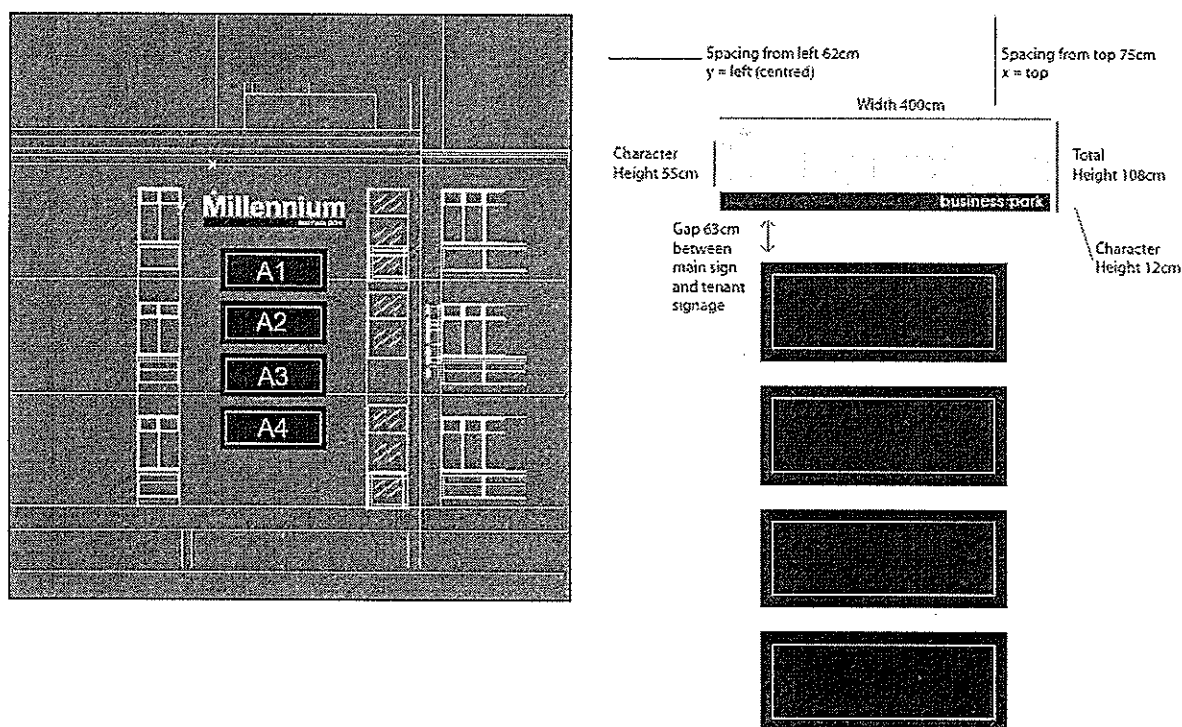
Elevation of Position A – Indicating layout (Block A – from Century Avenue)
